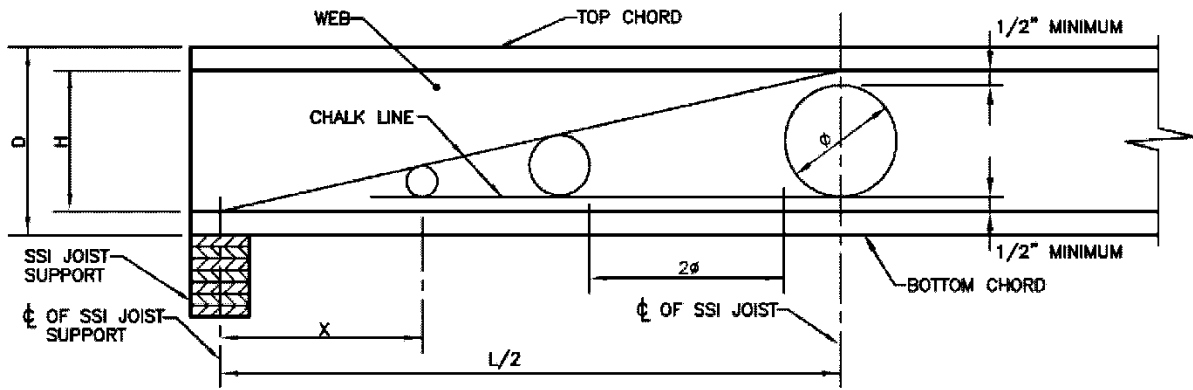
TYPICAL HOLES - SPACING REQUIREMENTS
